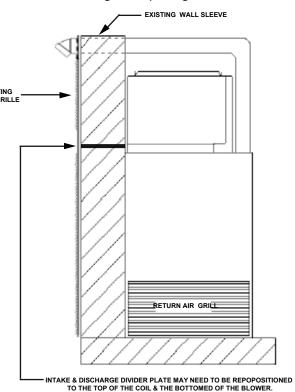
INSTALLATION W/ WALL SLEEVE AND EXTERIOR GRILL. ILLUSTRATED AS A STANDARD LEFTSIDE RETURN AIR.
